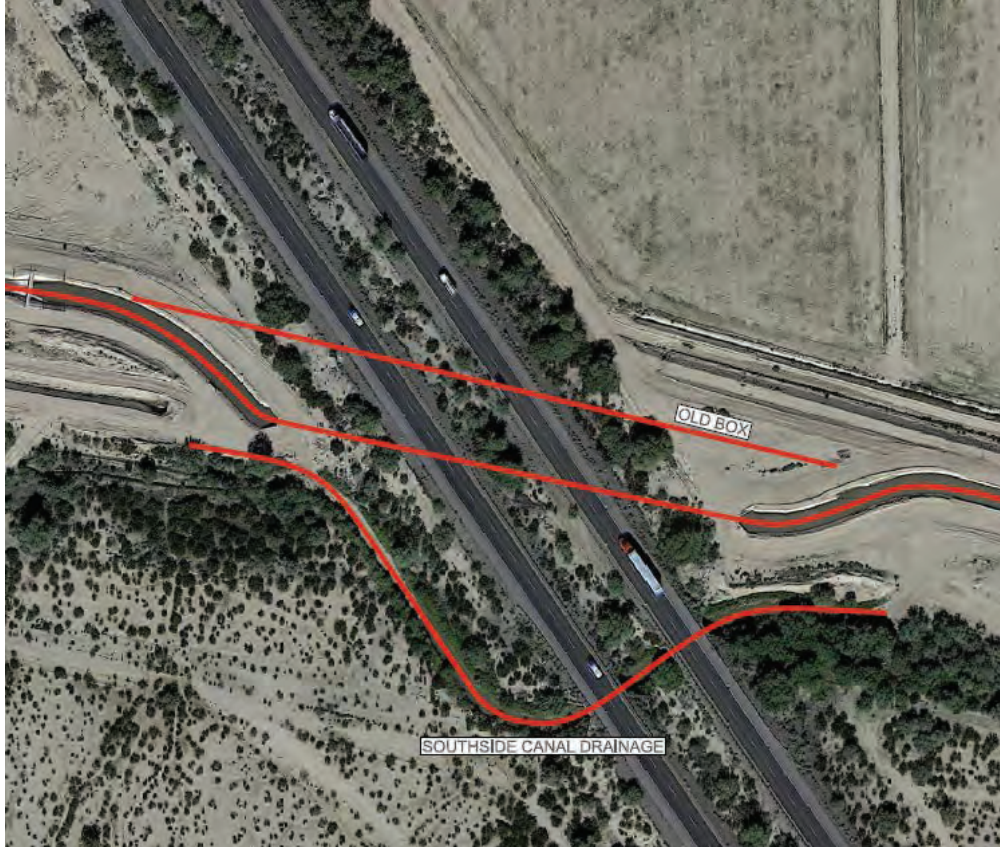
Southside Canal unused and current box culvert and drainage channel under I-10.
